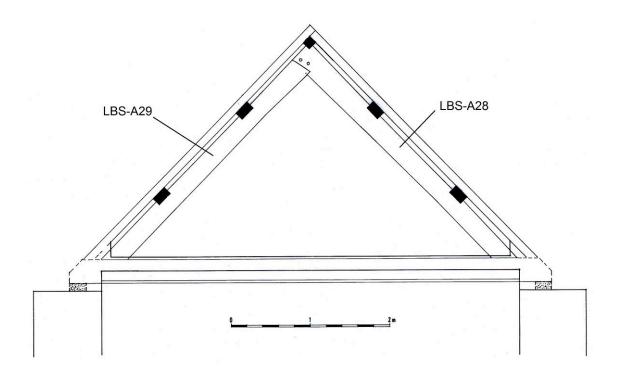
Central hall/parlour range; truss 3 (east face), showing the location of samples LBS-A28 and LBS-A29 (Martin Roberts)
